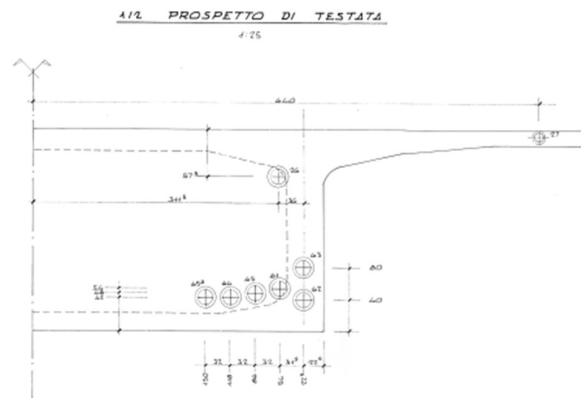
Cross-sectional view and arrangement of tendons at abutment sp1.
